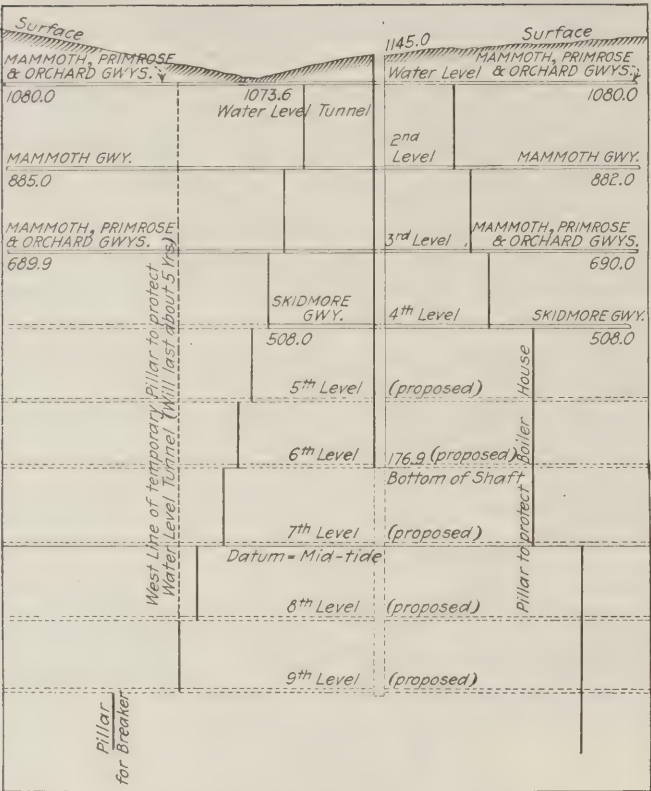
LONGITUDINAL SECTION OF SHAFT PILLAR
